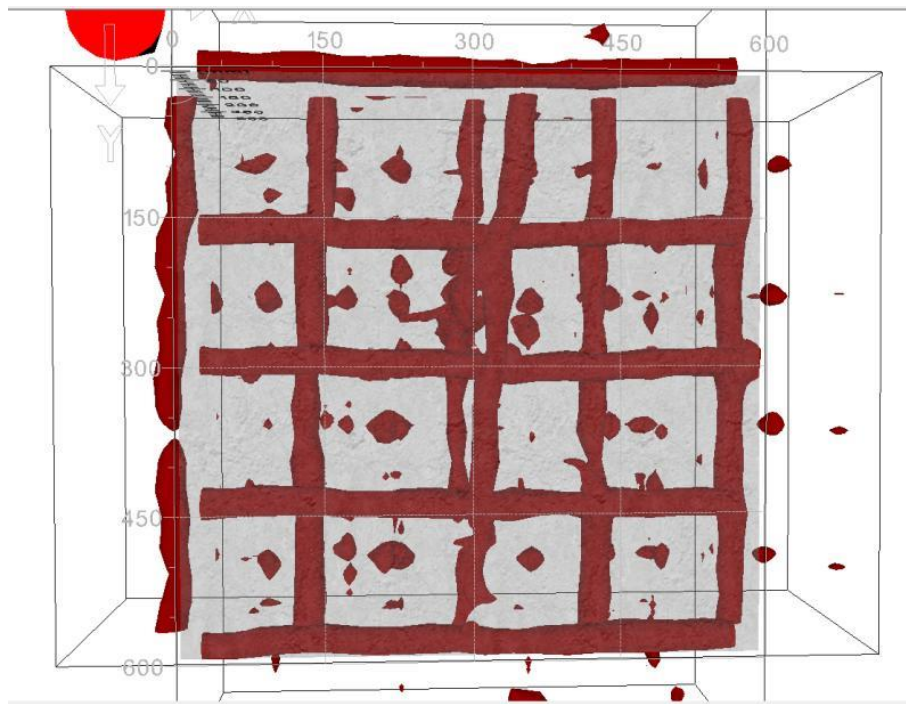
3D view of 2nd scan of Side -A showing the rebar details
